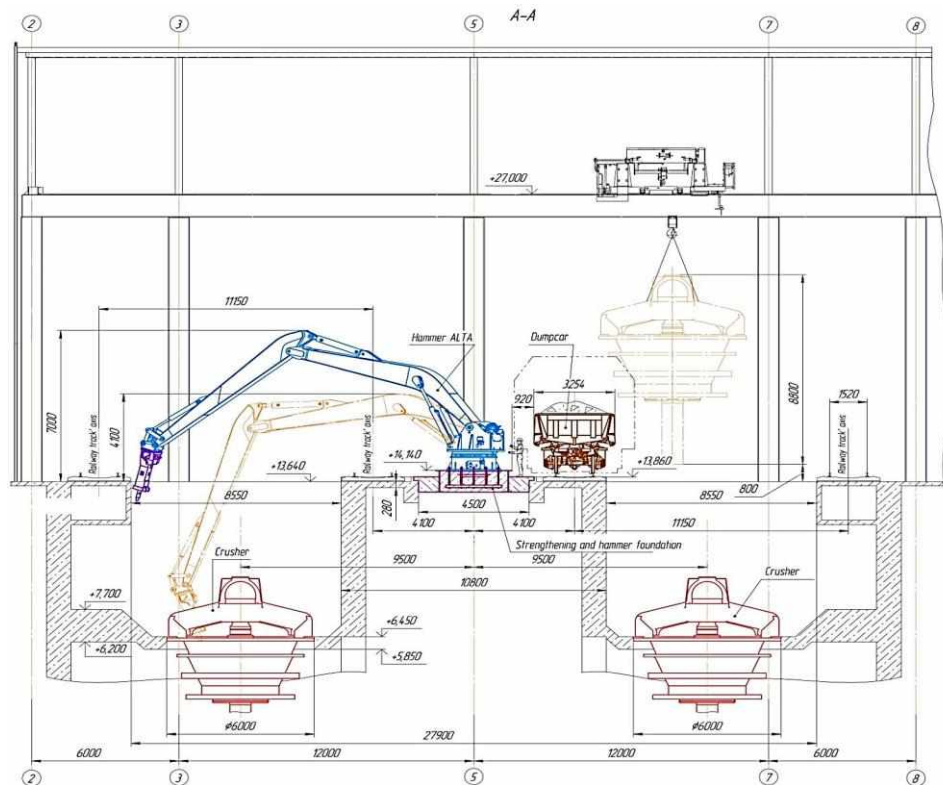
The plan for the installation of the hammer GR-158 at the mark +13,640. Cross section A-A of fig. 5
